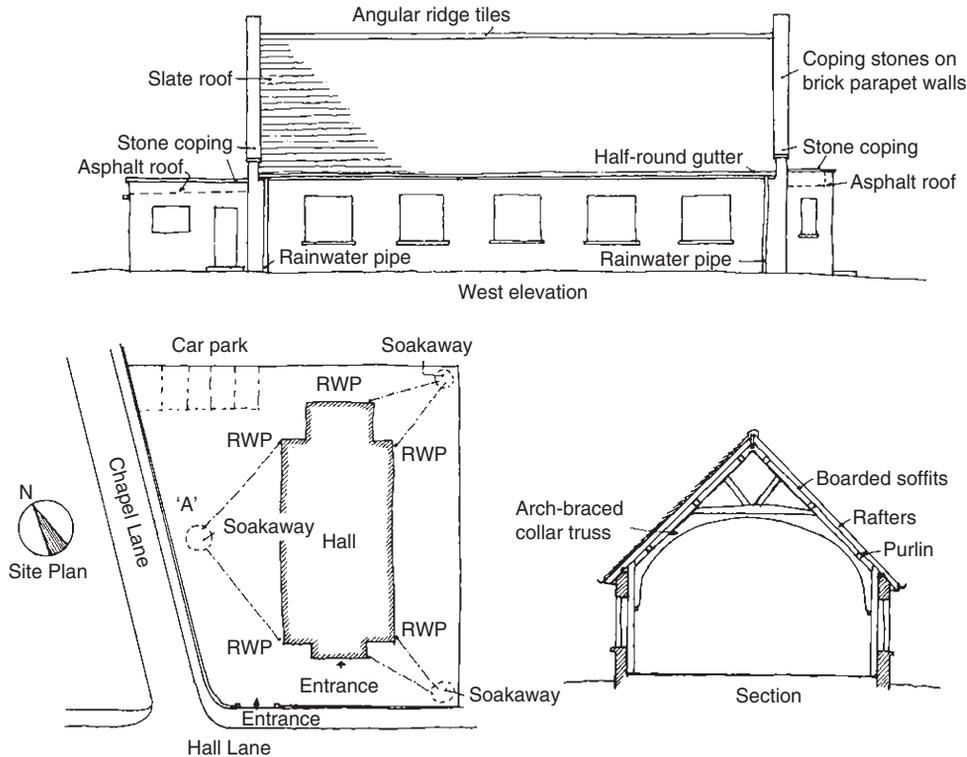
Figure AVI Details of roof and surface water drainage system referred to in Appendix VI
